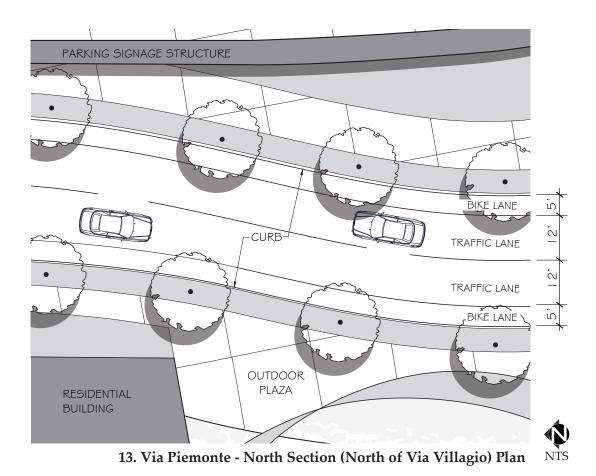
Via Piemonte - North Section (North of Via Villagio) Private Streetscape Section and Plan
